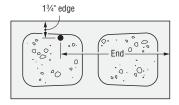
Anchor Installed in Cell Opening (Top of Wall)
